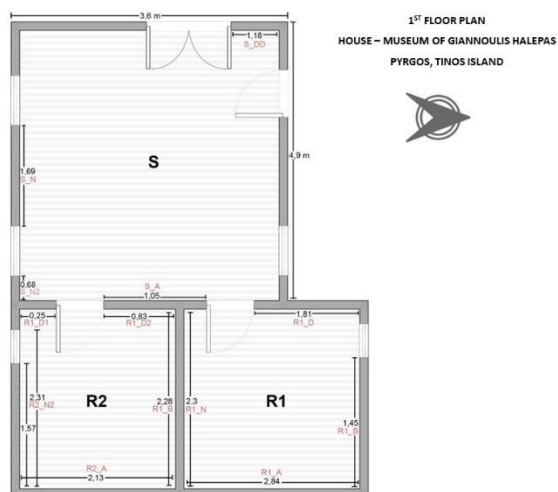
The plan of the upper floor of the House – museum “Giannoulis Halepas”.
